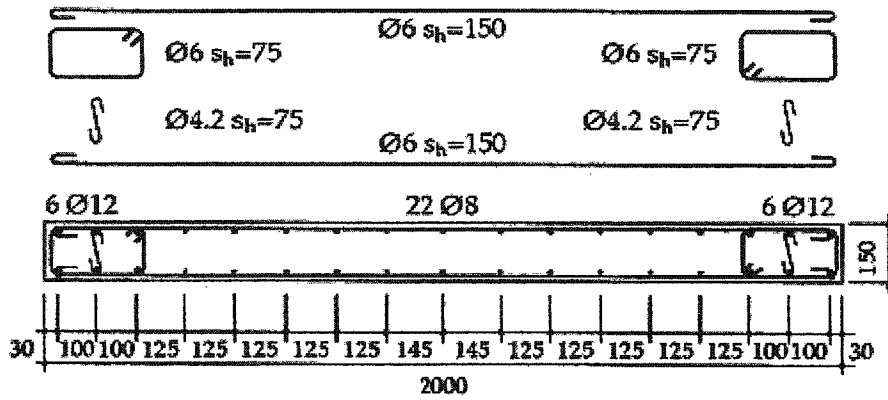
Reinforcement details of WSH3 (after Dazio et al., 1999)
